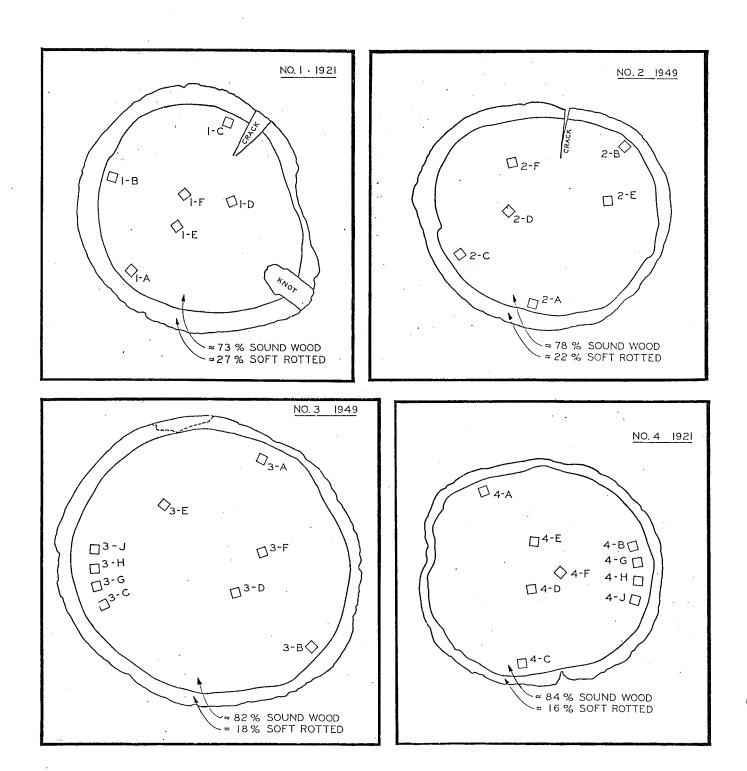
Timber pile cross-section and location of removed static bending specimens.
